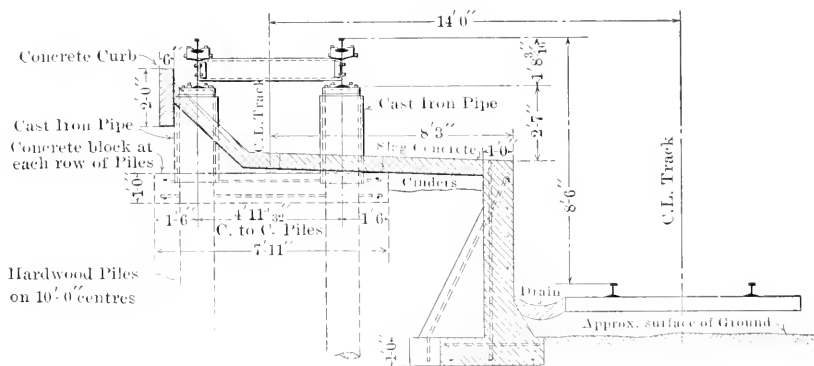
HALF SECTION OF ELEVATION CINDER PIT
